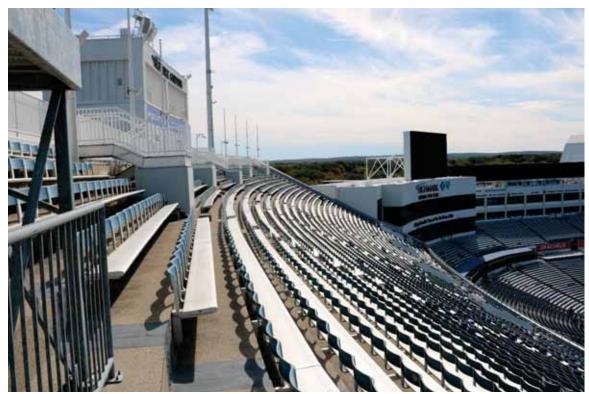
View from 300 Level seating at East End Zone, facing southeast (Commonwealth 2022).
